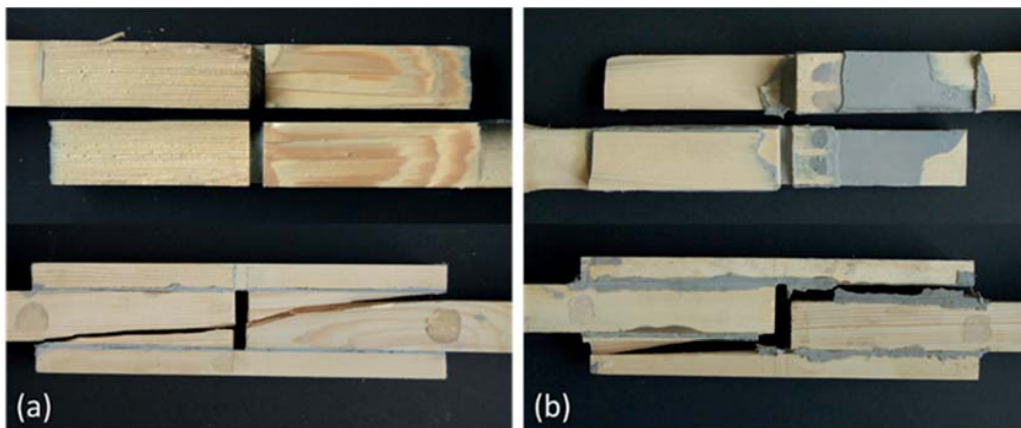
Failure modes in tension: (a) adherend failure for epoxy joints (E_T3) and (b) mixed failure for acrylic joints (A_T1), plan and side views
